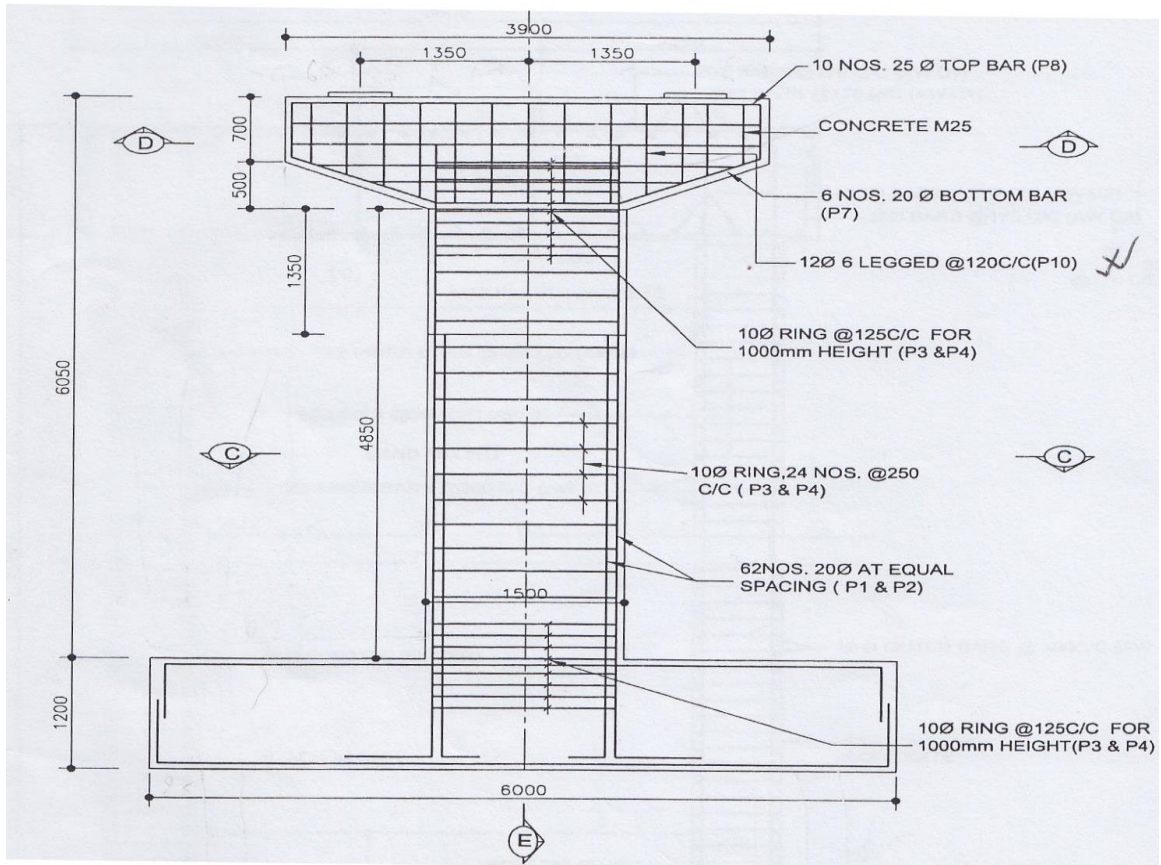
Reinforcement details in Bridge pier After 2000 Well
